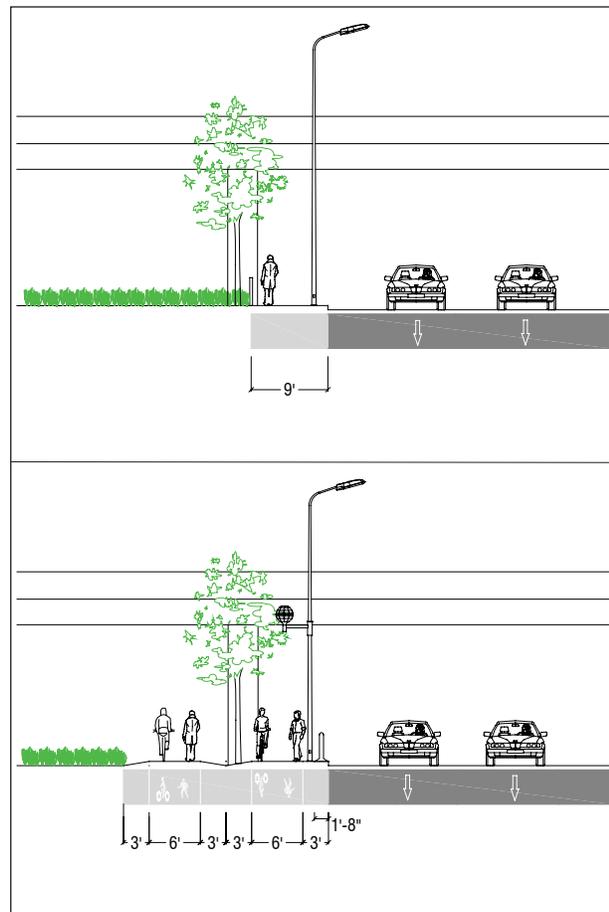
Major Deegan Expressway Service Road sidewalk, existing and recommended cross section (facing south)
